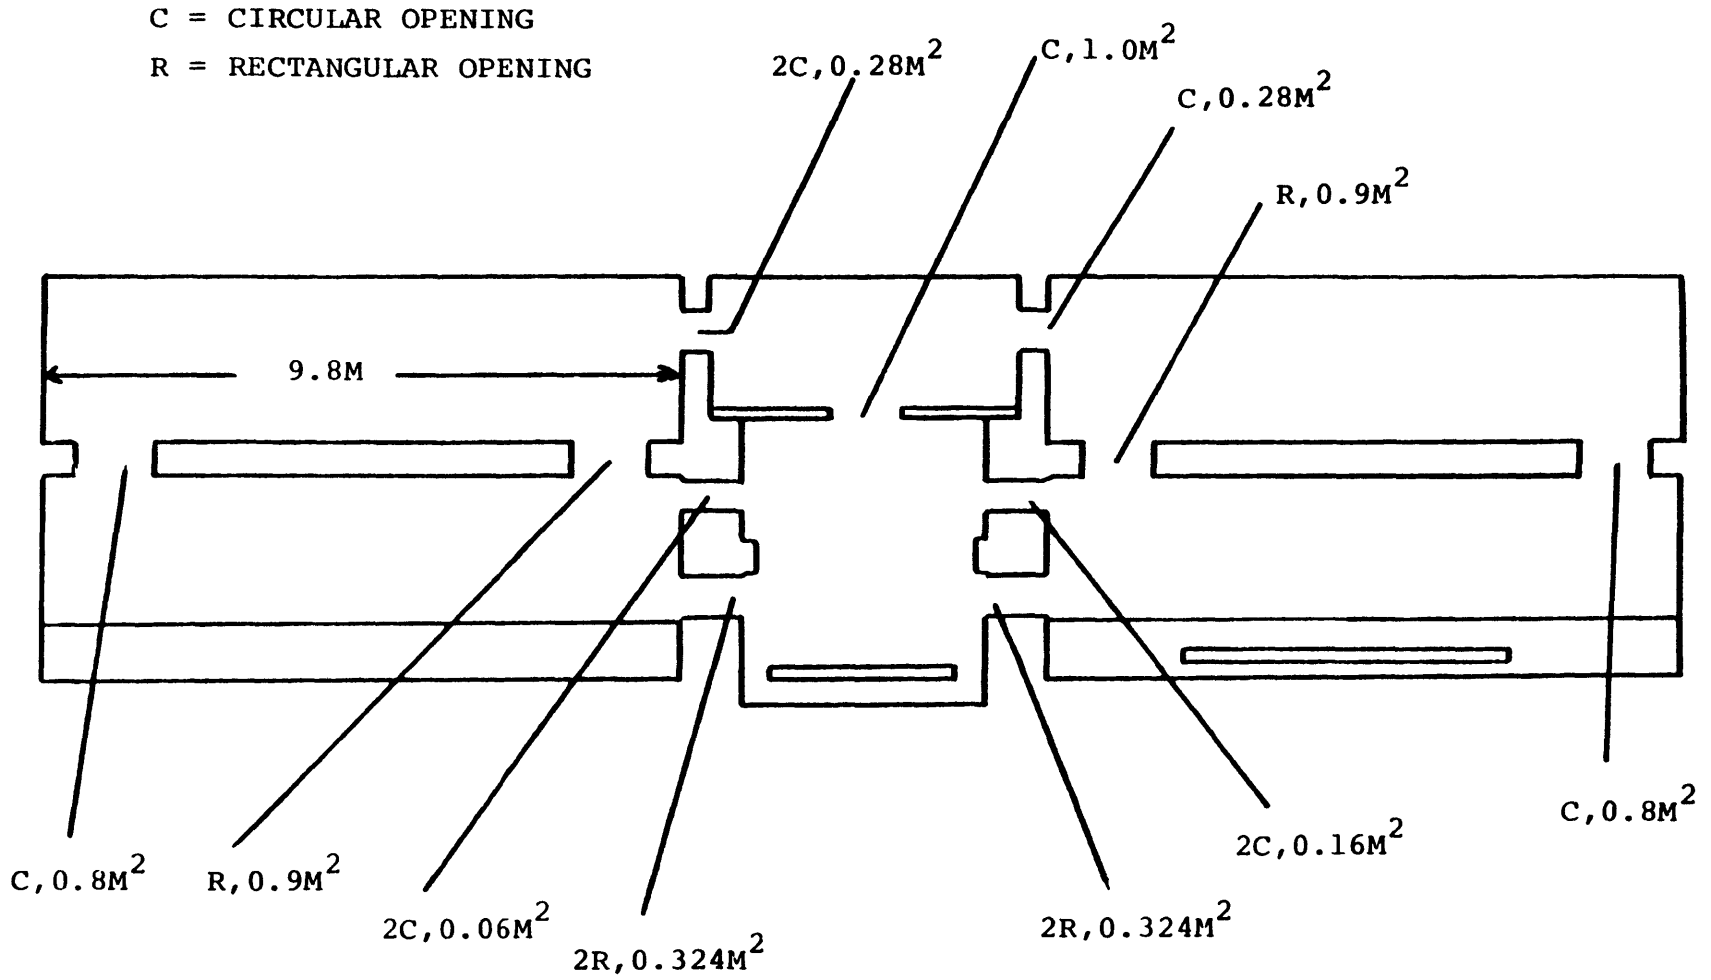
ROOM CONNECTION ARRANGEMENT AND SIZES FOR BATTELLE FRANKFURT FACILITY
